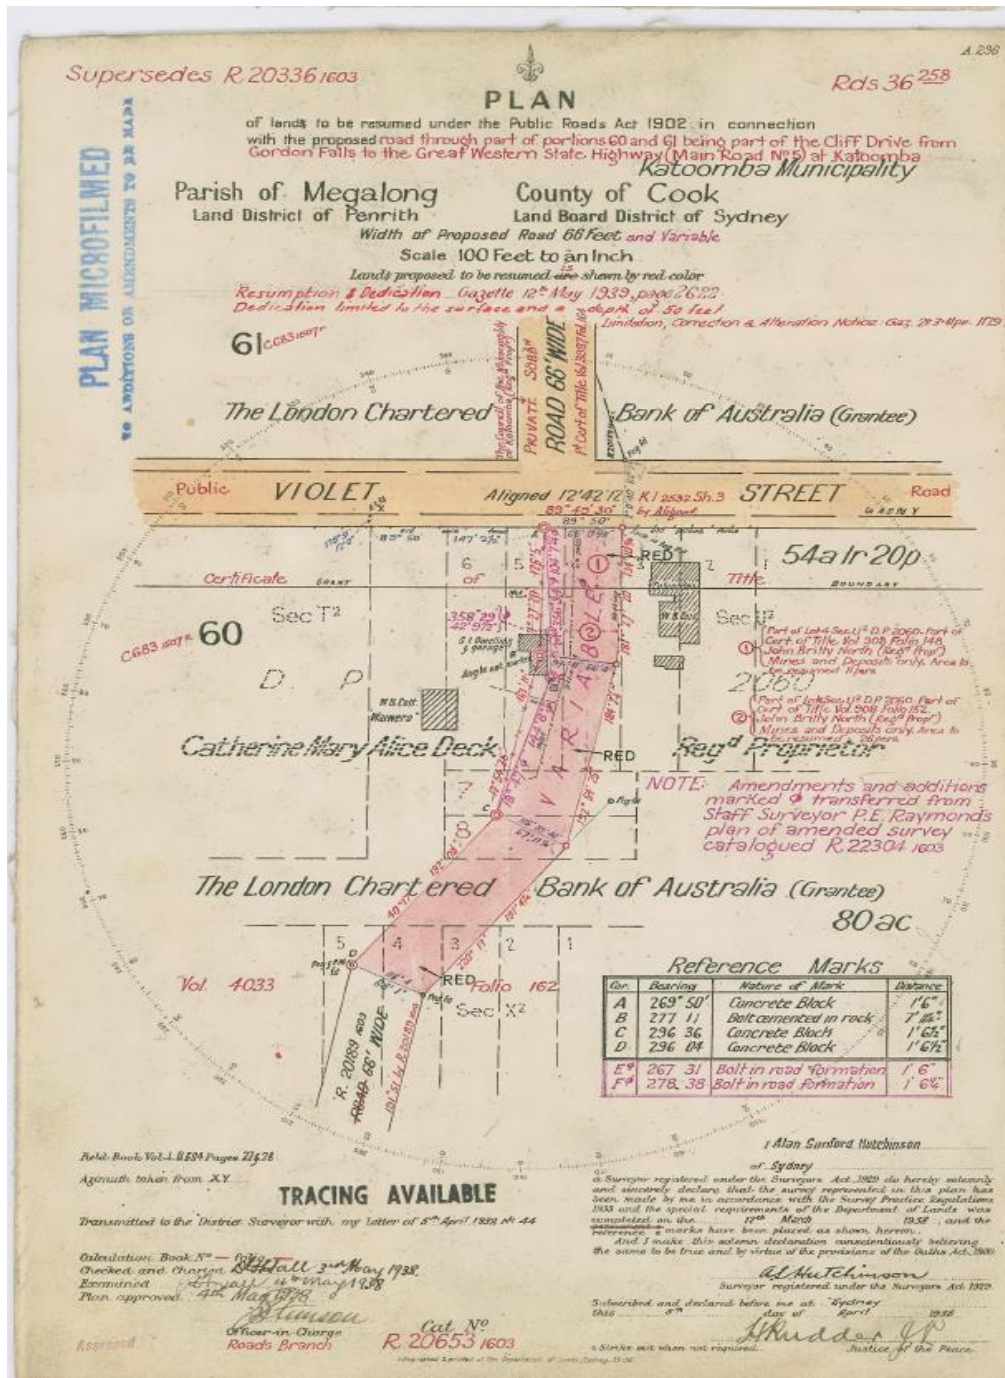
Plan of lands to be resumed under the Public Roads Act 1902 in connection with the proposed road through part of portions 60 and 61 (being part of the Cliff Drive from Gordon Falls to the Great Western State Highway (Main Road No. 5) at Katoomba, March 1938. (Source: NSW Land & Property Information, Crown Plan 20653-1603)
